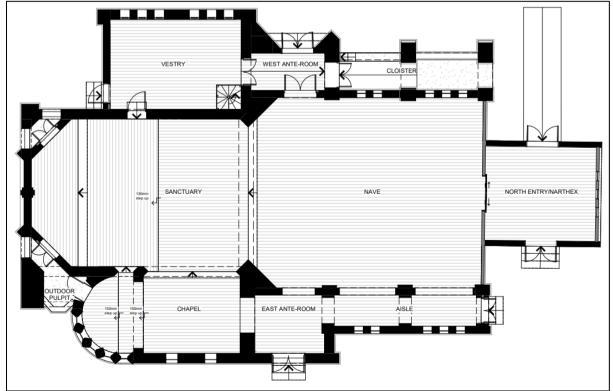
Floor Plan. North to right of image. (Source: JDA)
